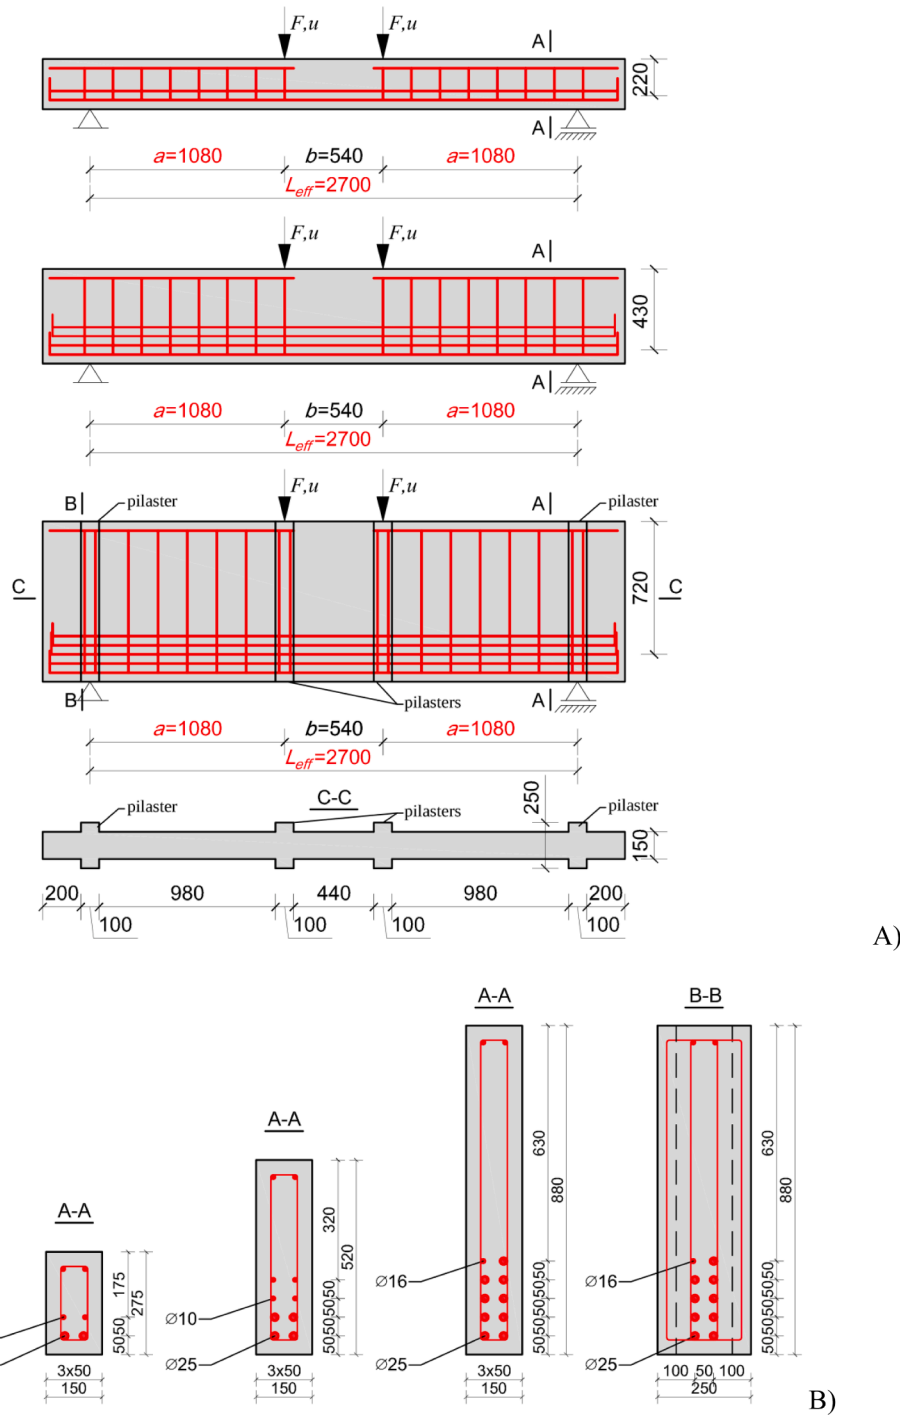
Experimental reinforced concrete beams of series '4' under four-point bending [22]: A) geometry, reinforcement arrangement, loading scheme and B) cross-sections.
